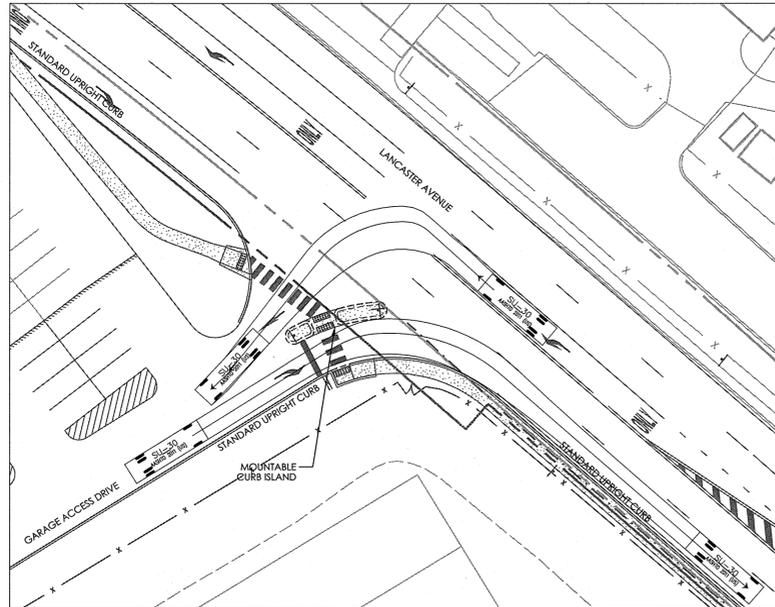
LANCASTER AVENUE TO GARAGE ACCESS DRIVE - LEFT TURN & GARAGE ACCESS DRIVE TO LANCASTER AVENUE - RIGHT TURN (SU-30)
